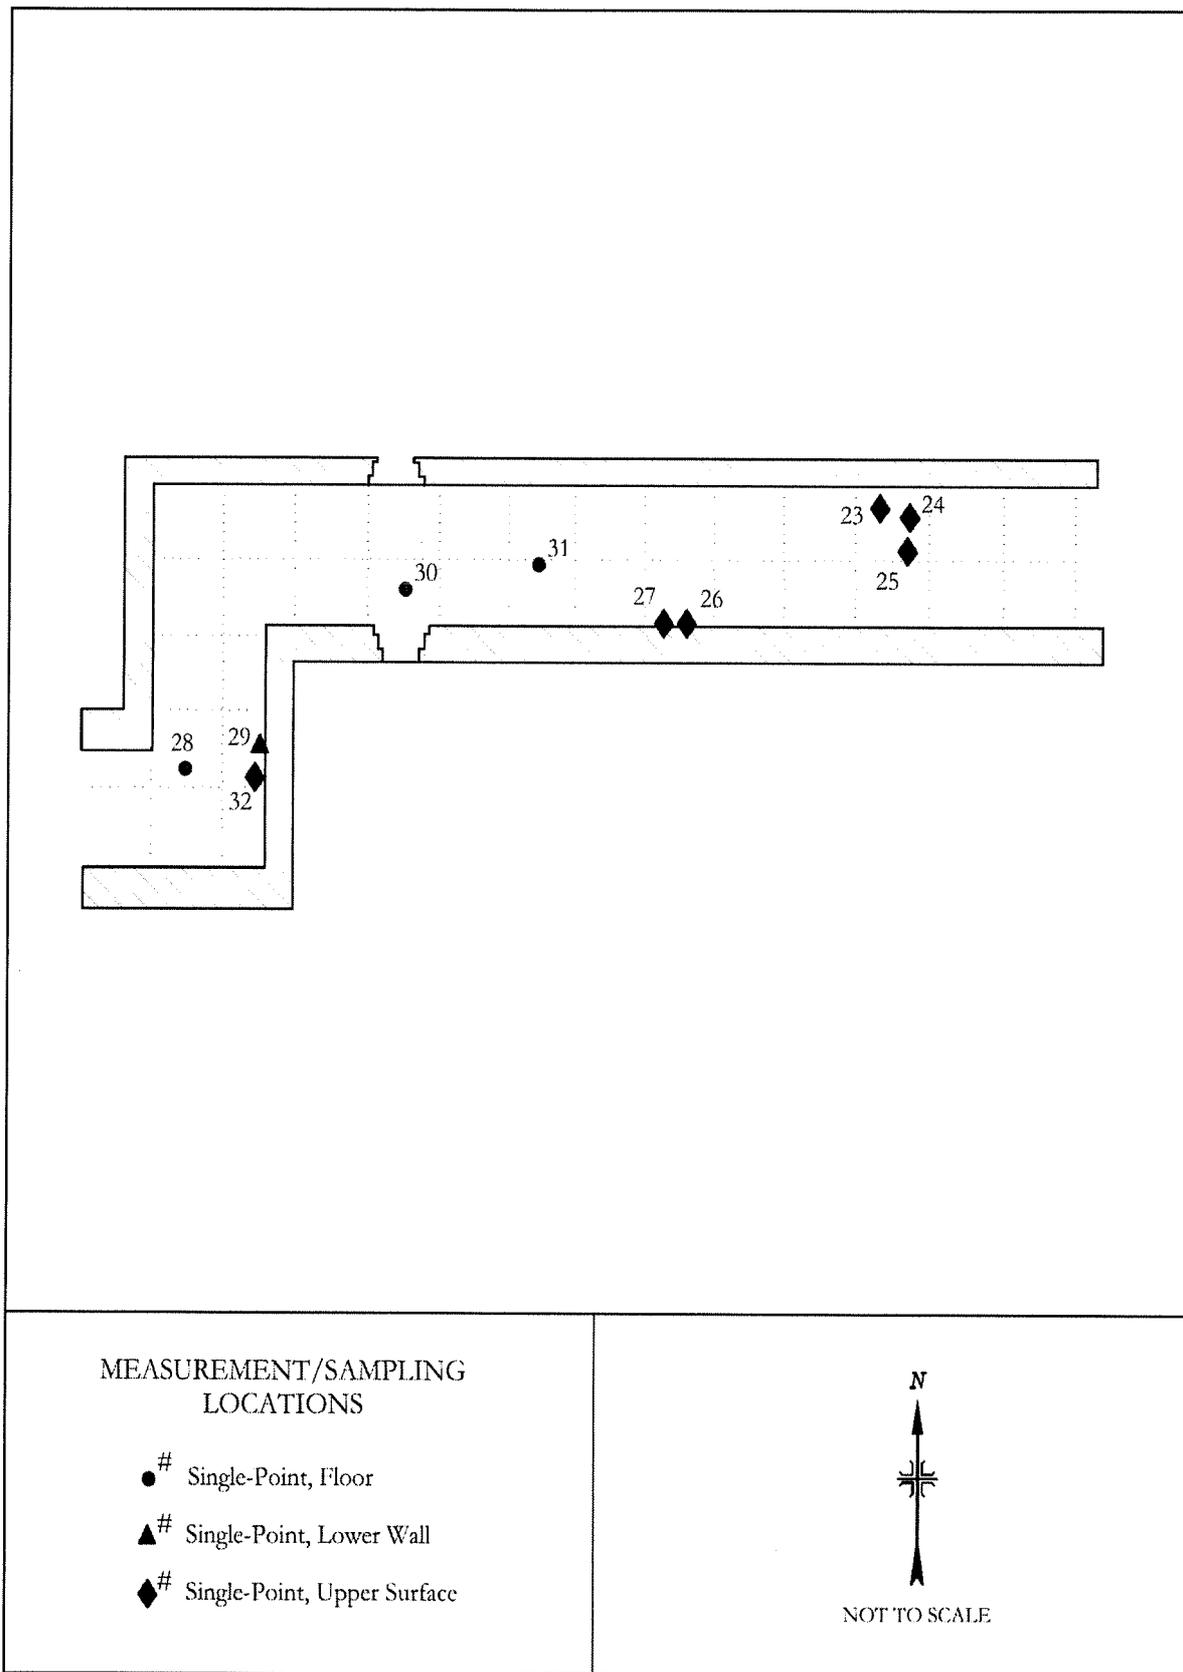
Auxiliary Building, Room 45 - Direct Measurement Locations
